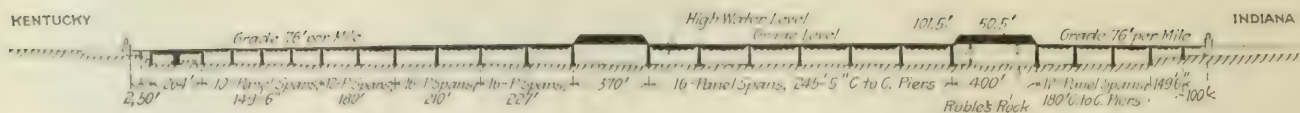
DIAGRAM ELEVATION OF LOUISVILLE BRIDGE ACROSS THE OHIO RIVER
